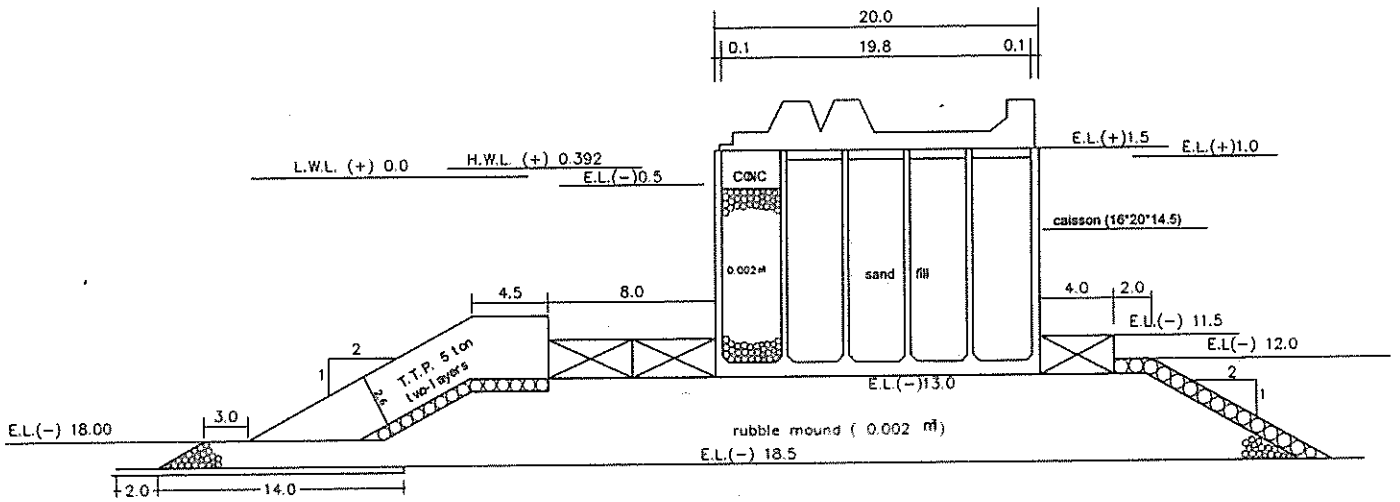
Cross-section of Sec. 11 before reinforcement (unit: m).
